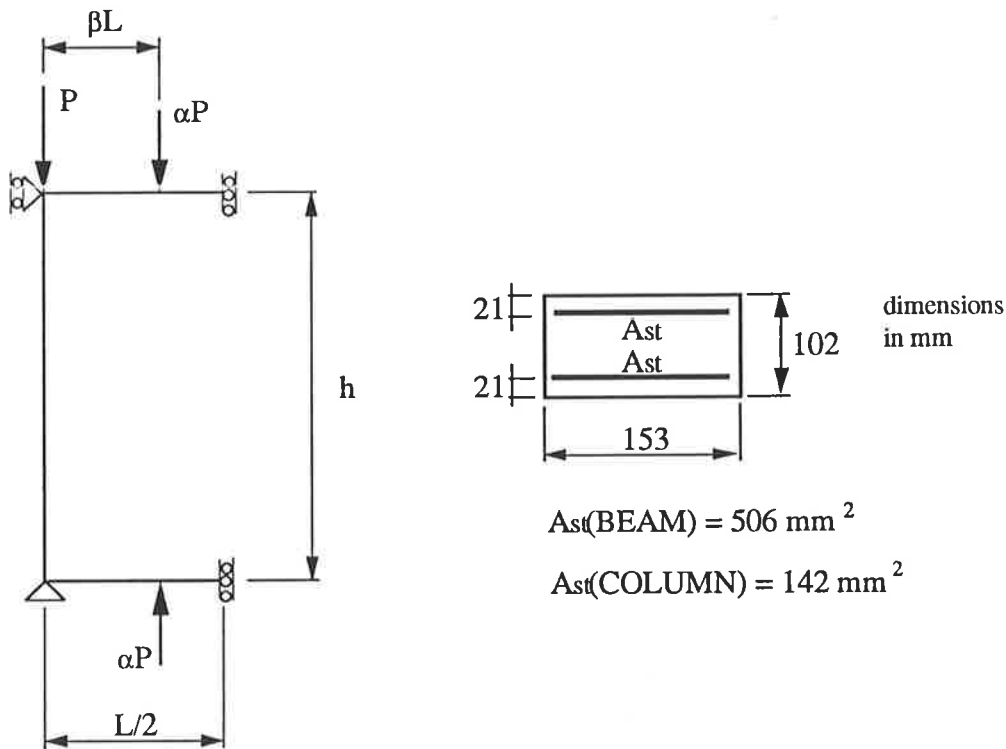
Test configuration and section details of frames tested by Furlong (1963)
